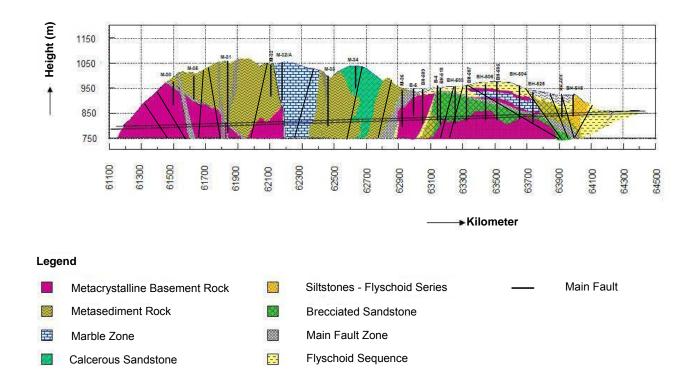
Simplified geological cross-section of Bolu Tunnels showing rock formations (Işık, 2009)
